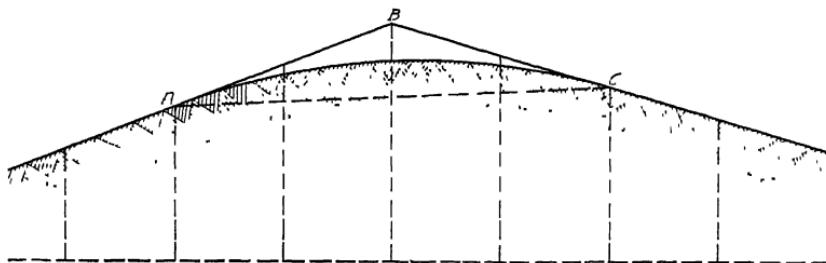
Typical Road Section Showing Rounding Off of Meeting Points of Curves
